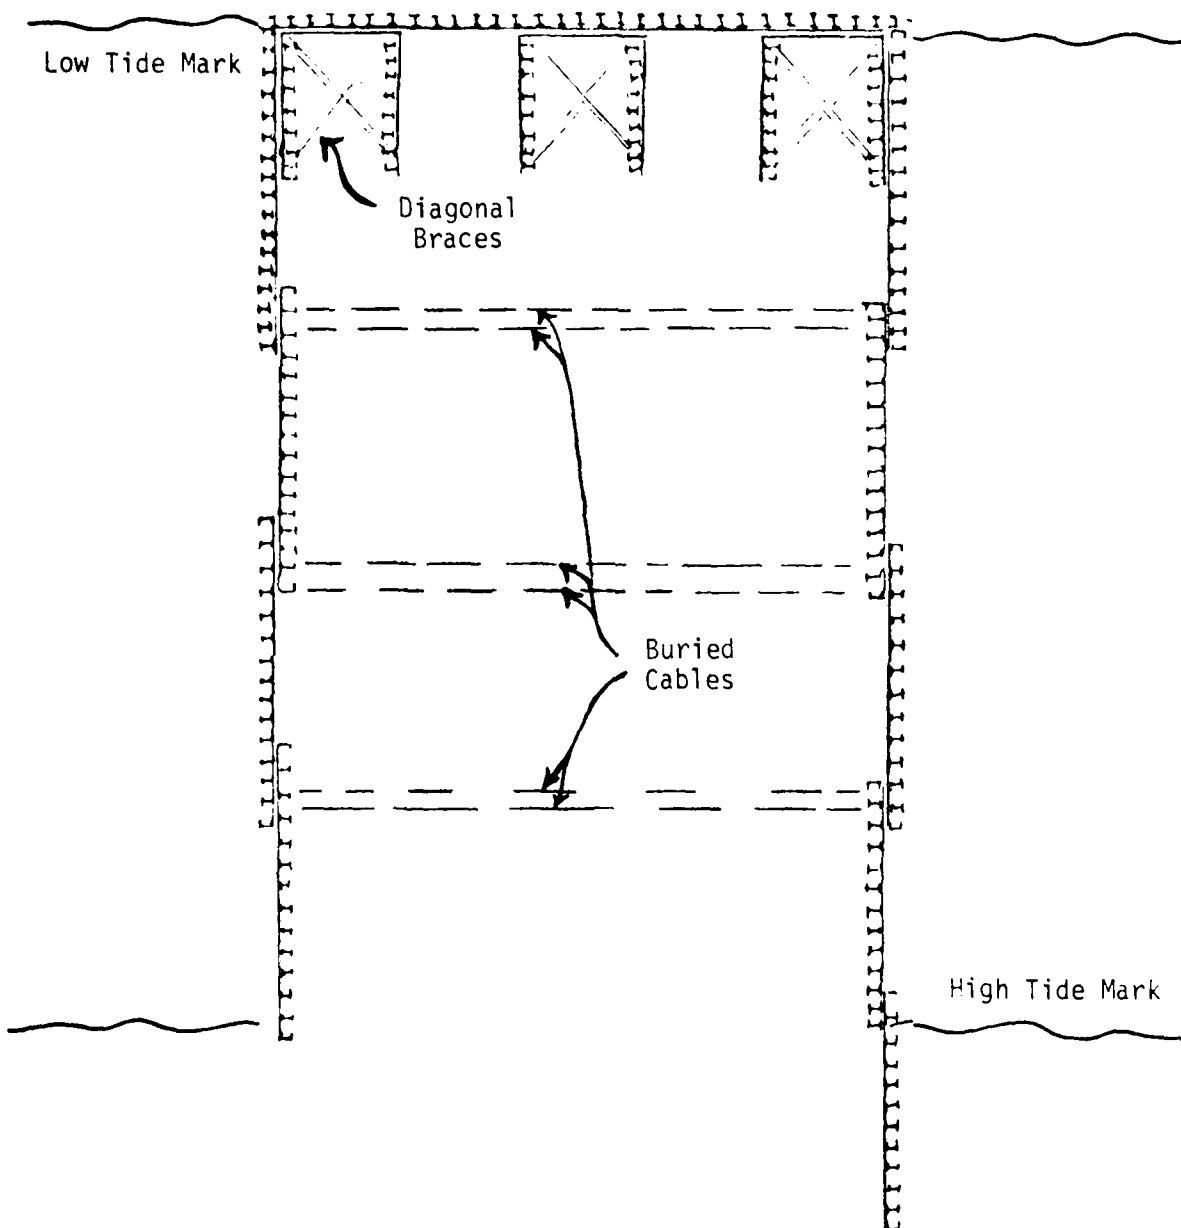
SCHEMATIC SKETCH OF SAND JETTY PROTECTIVE
